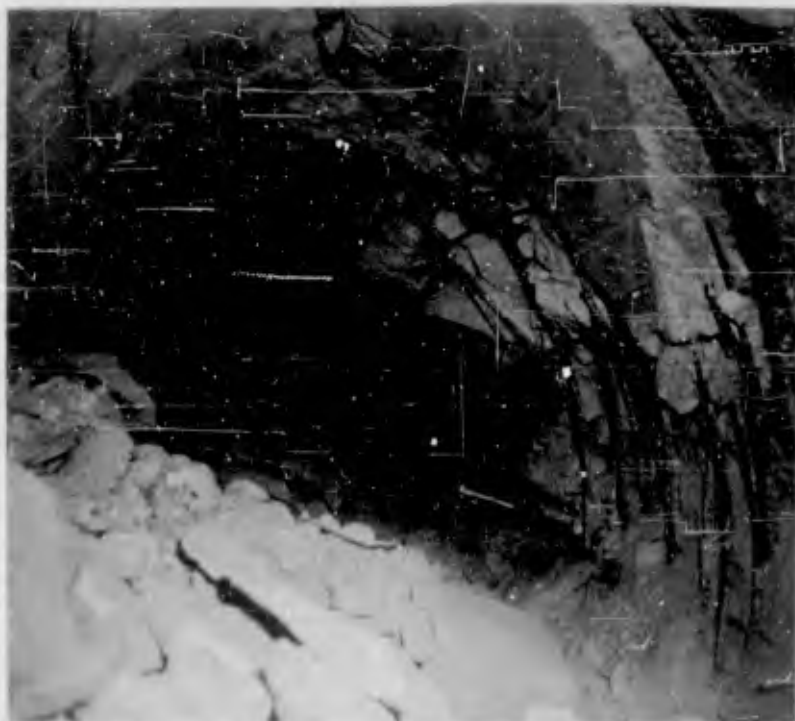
Test Section B3b (postshot) (DASA - NOU 237-11 NTS-62).
